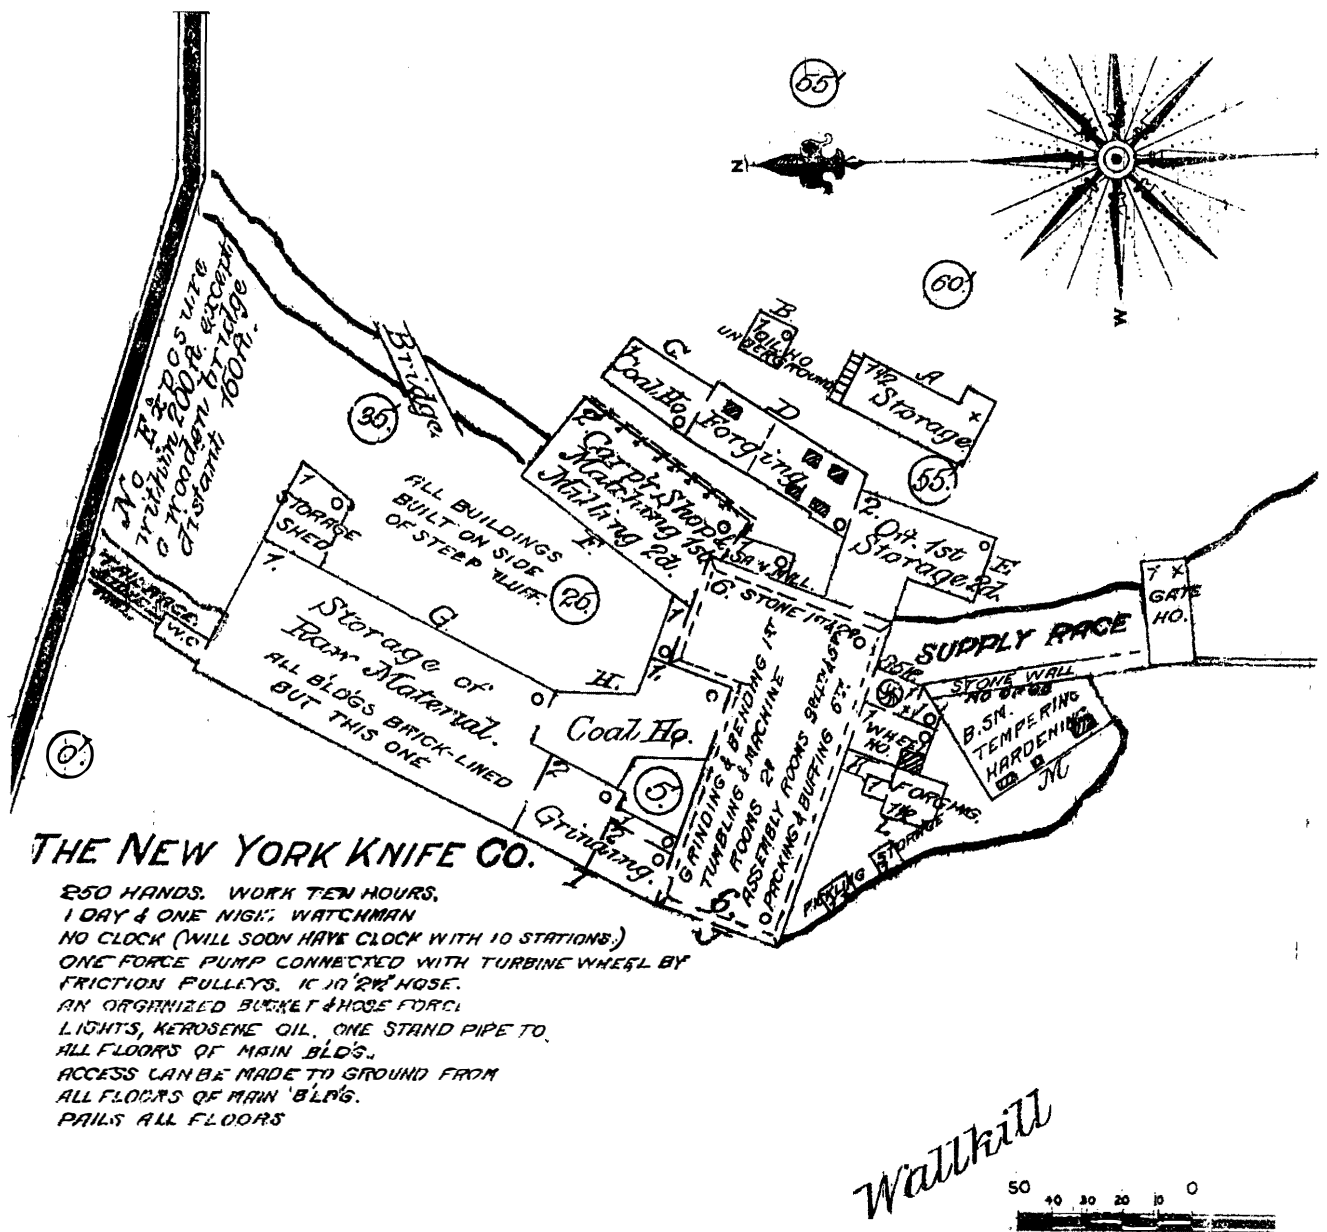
The 1885 Sanborn Insurance Map, which depicts the original building, with additions on its northeast and northwest corners and on the south and east sides. (New York State Library)
